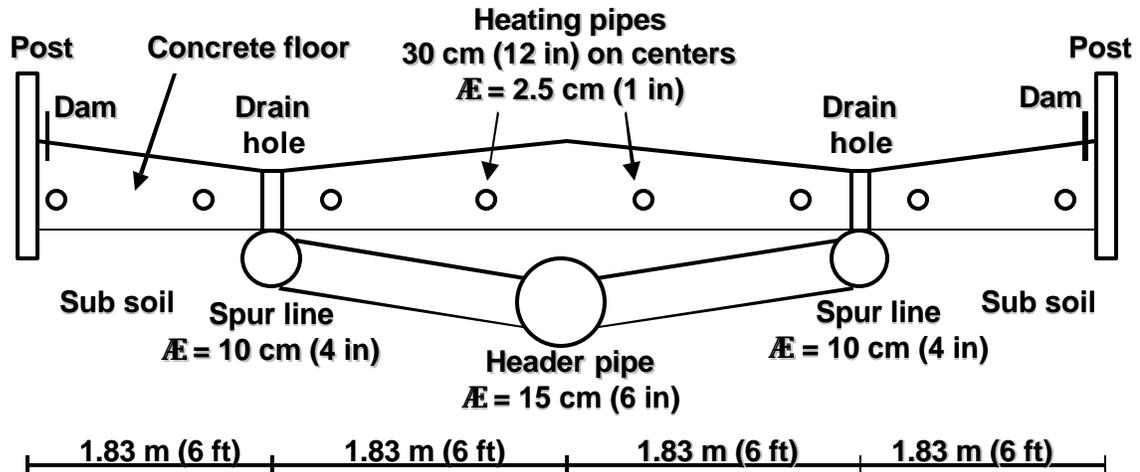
Generalized cross section (not to scale) of a typical heated ebb and flood floor.
